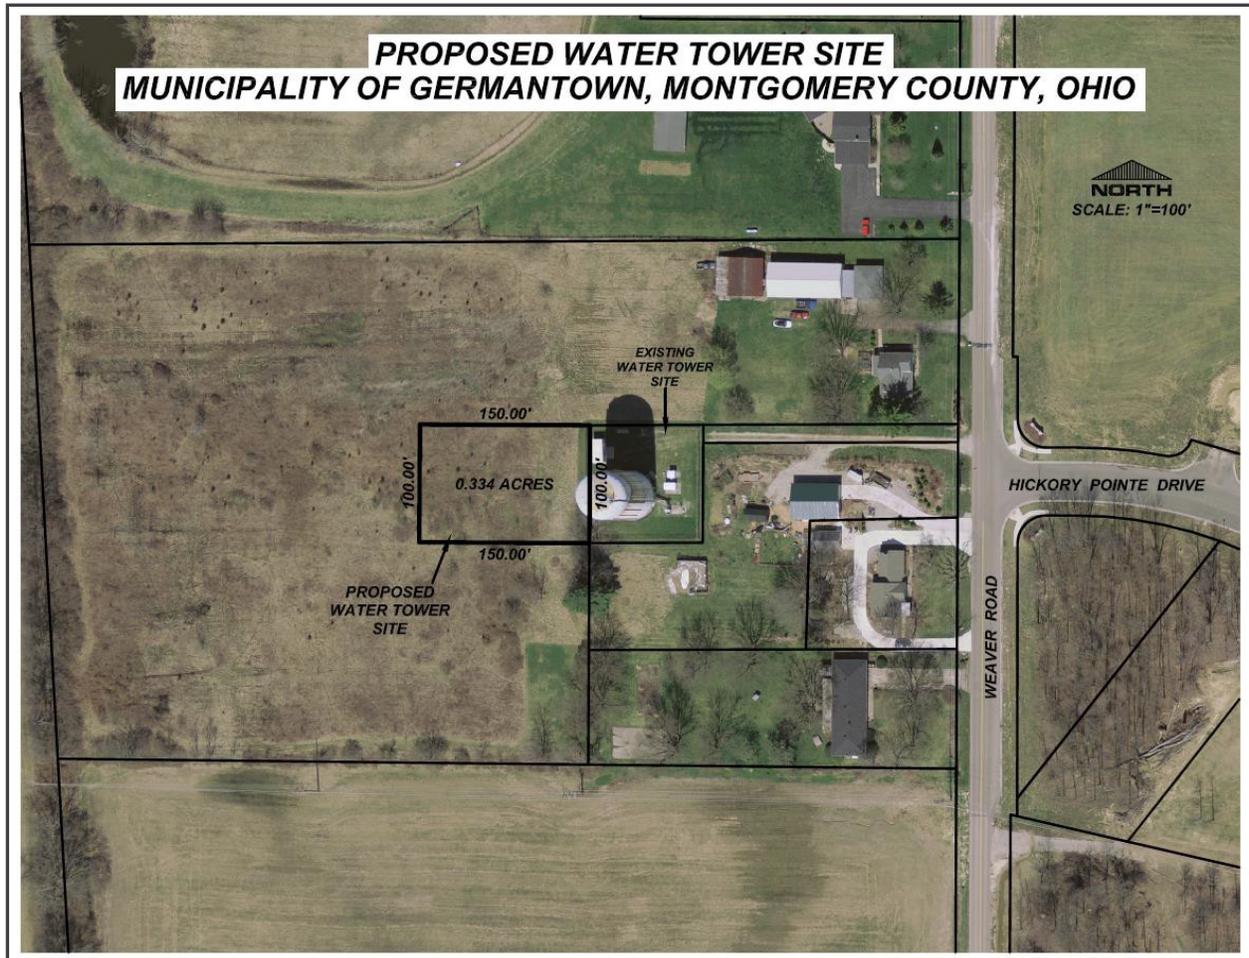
Project location - Existing water tower and 0.344-acre site marked for proposed tank
